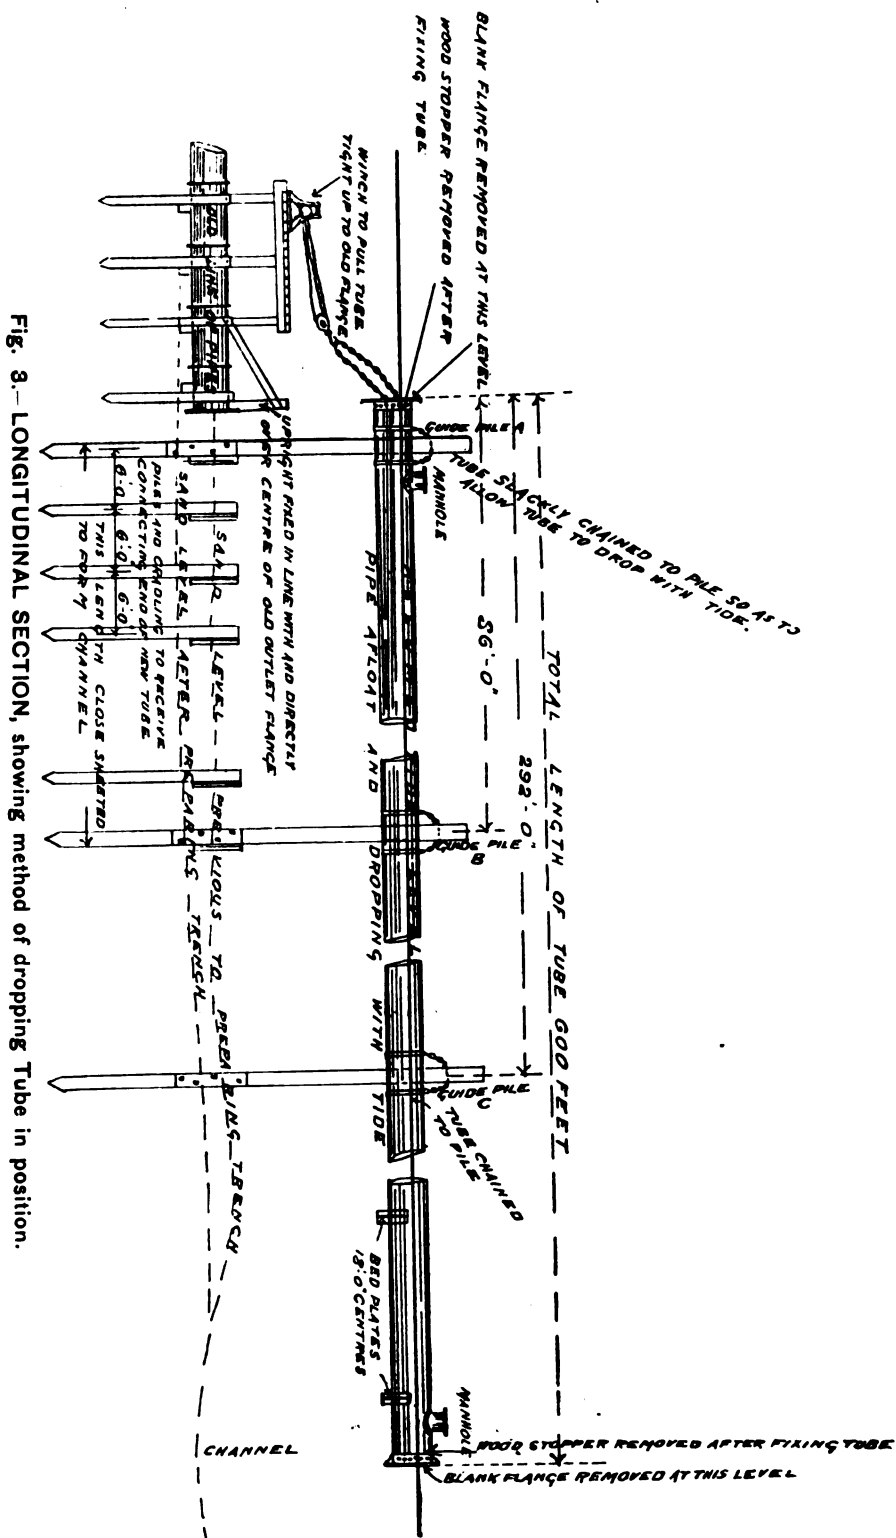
LONGITUDINAL SECTION, showing method of dropping Tube in position.
